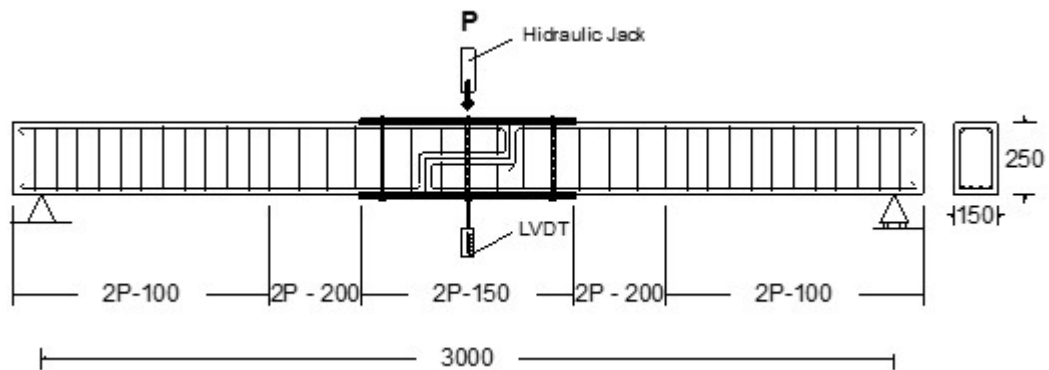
The third beam with fully covering steel plate at the connection or BC-2 (unit in mm)
